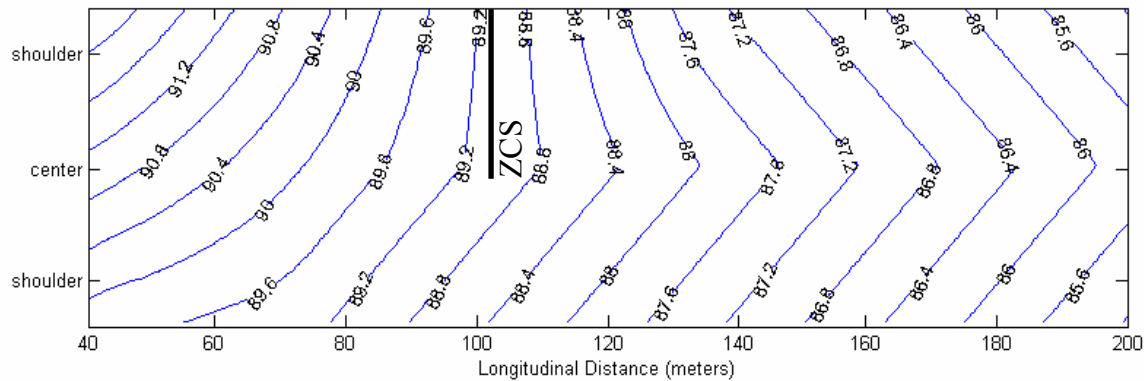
Contour plot of the surface elevation of a *Type-II* road (4-lane road, $S_x=1.0\%$, ZCS at 103m station, elevation in feet).
